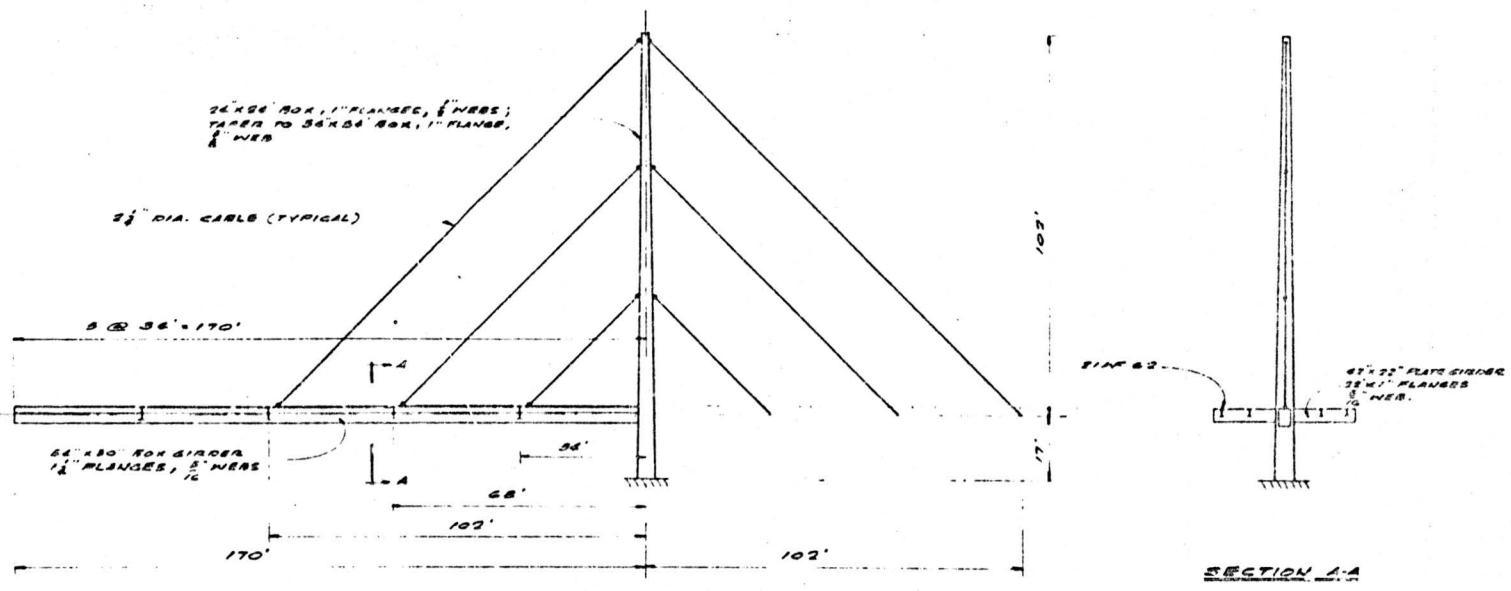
CONCEPT DESIGN SKETCH OF STAYED GIRDER BRIDGE
